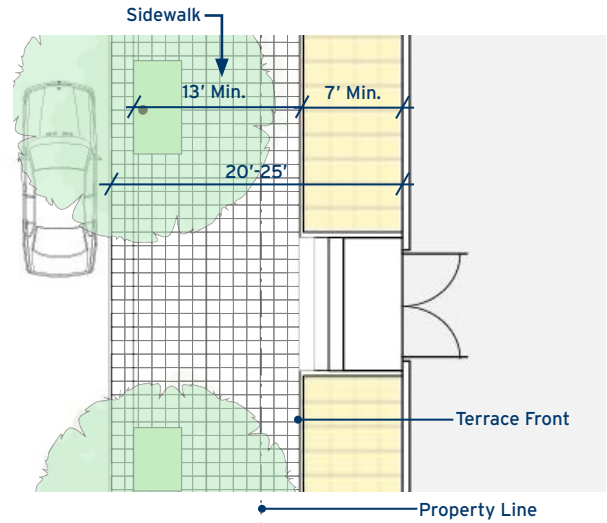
Raised Commercial Terrace Conceptual Plan
